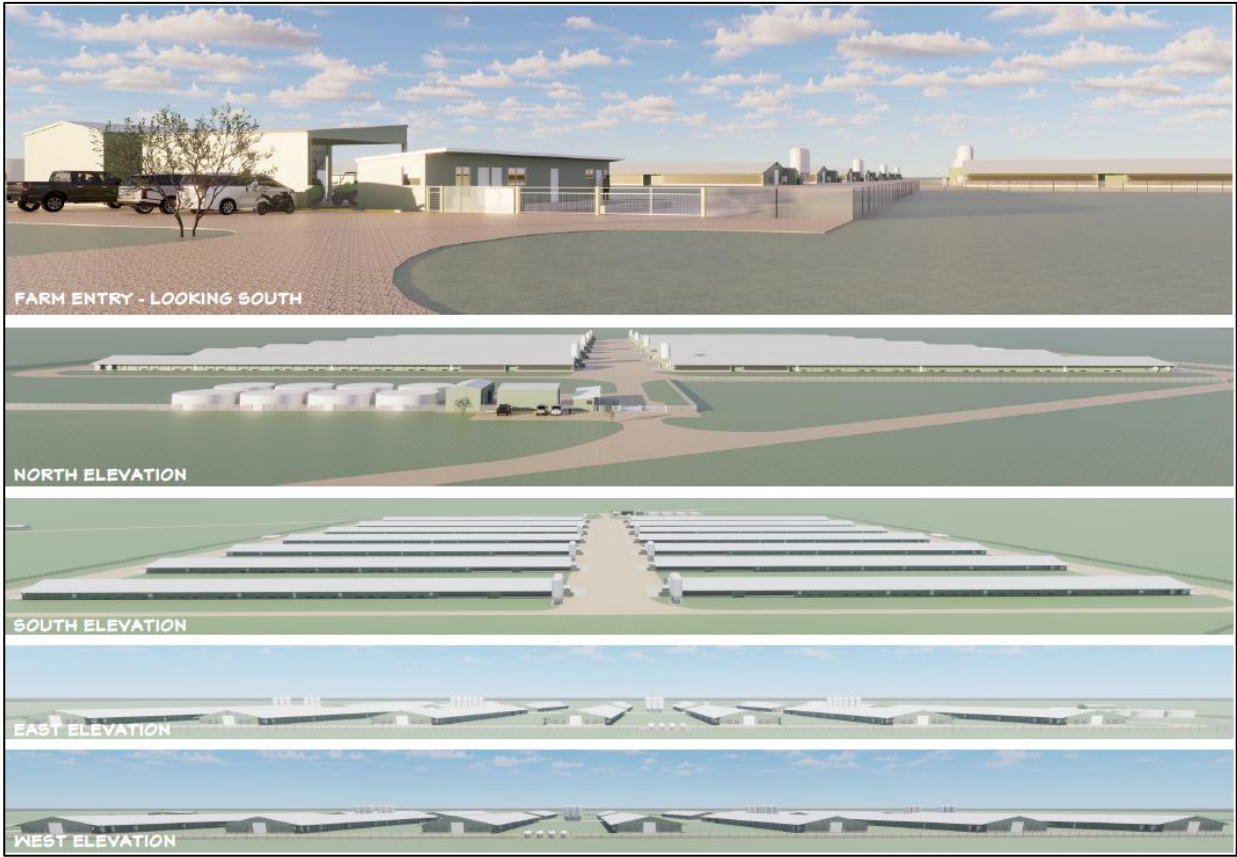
Willow Tree Broiler Farm Elevations (Construction Cohort, 2026)
